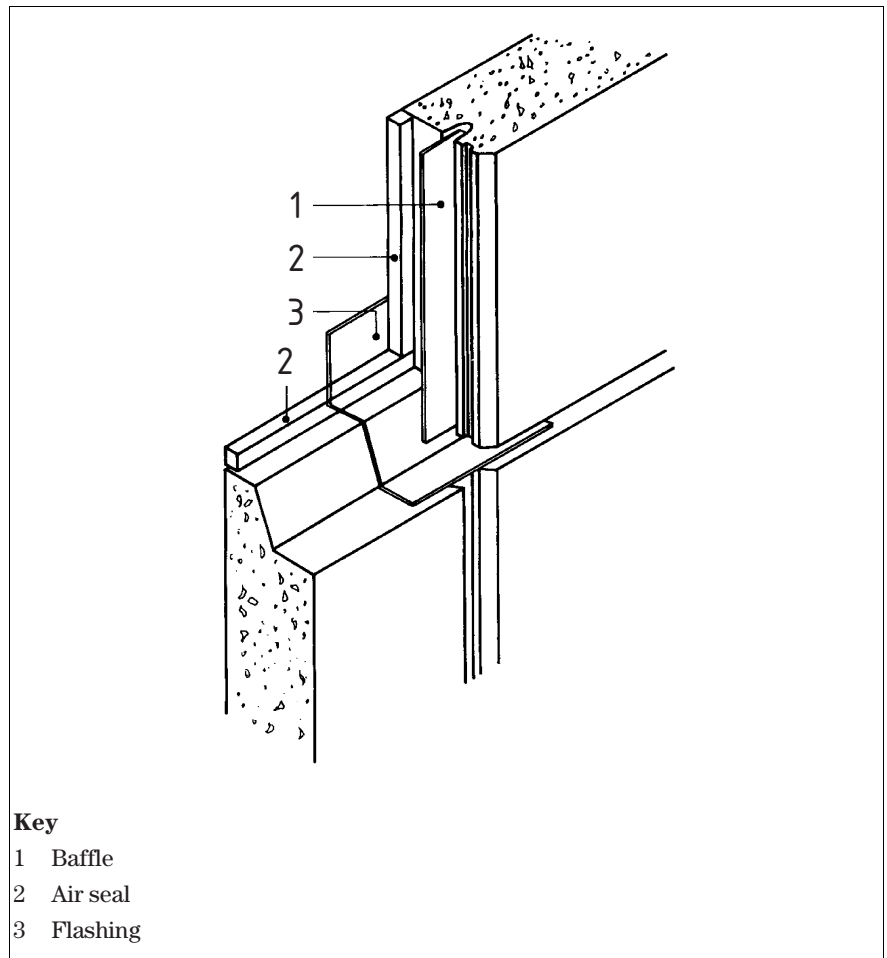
Diagram showing typical intersection between horizontal and vertical two-stage joints in an external wall
